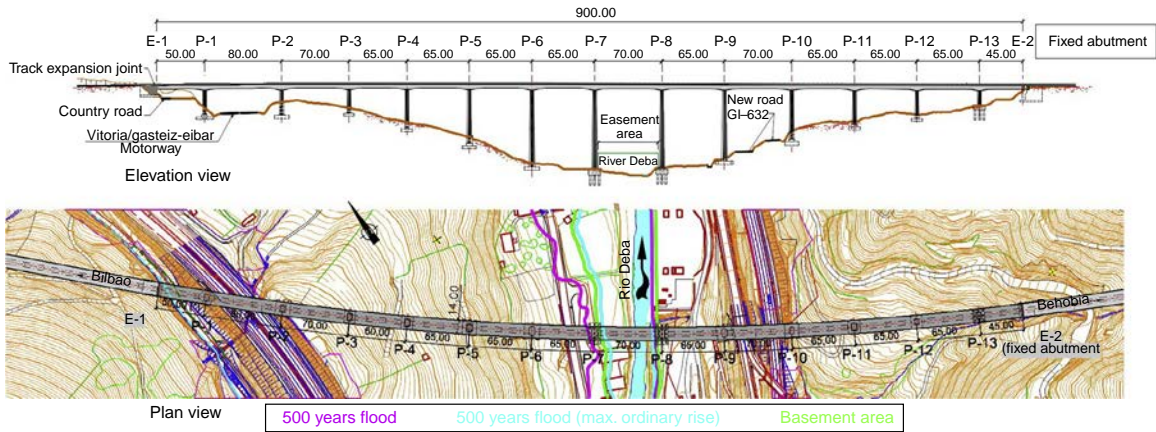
Elevation and plan views of the variable depth prestressed concrete deck ultimately built.
